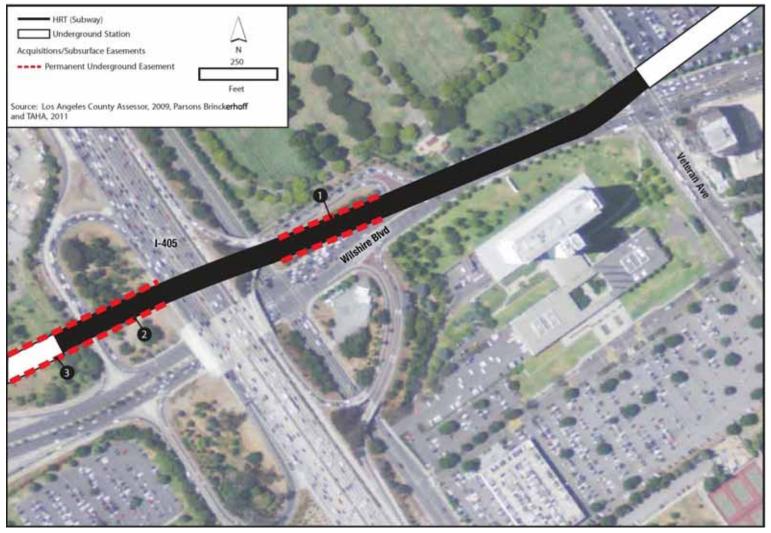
Permanent Underground Easements from Westwood/UCLA Off-Street Station to Westwood/VA North Station
